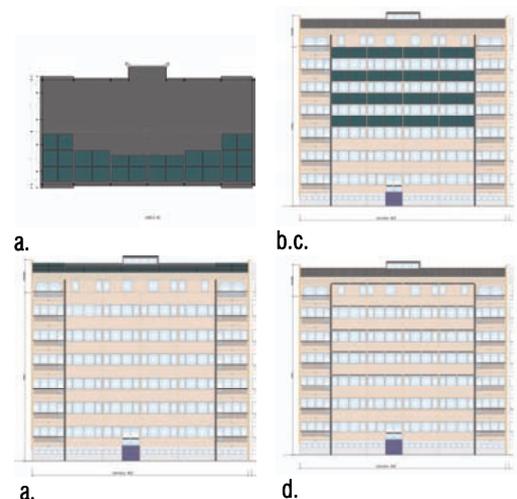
Analyzed design variants: a. I Design Variant: roof 40° (roof and facade layouts), b. II Design Variant: parapet 90°, c. III Design Variant: parapet 45°, d. IV Design Variant: sun shading 0°
